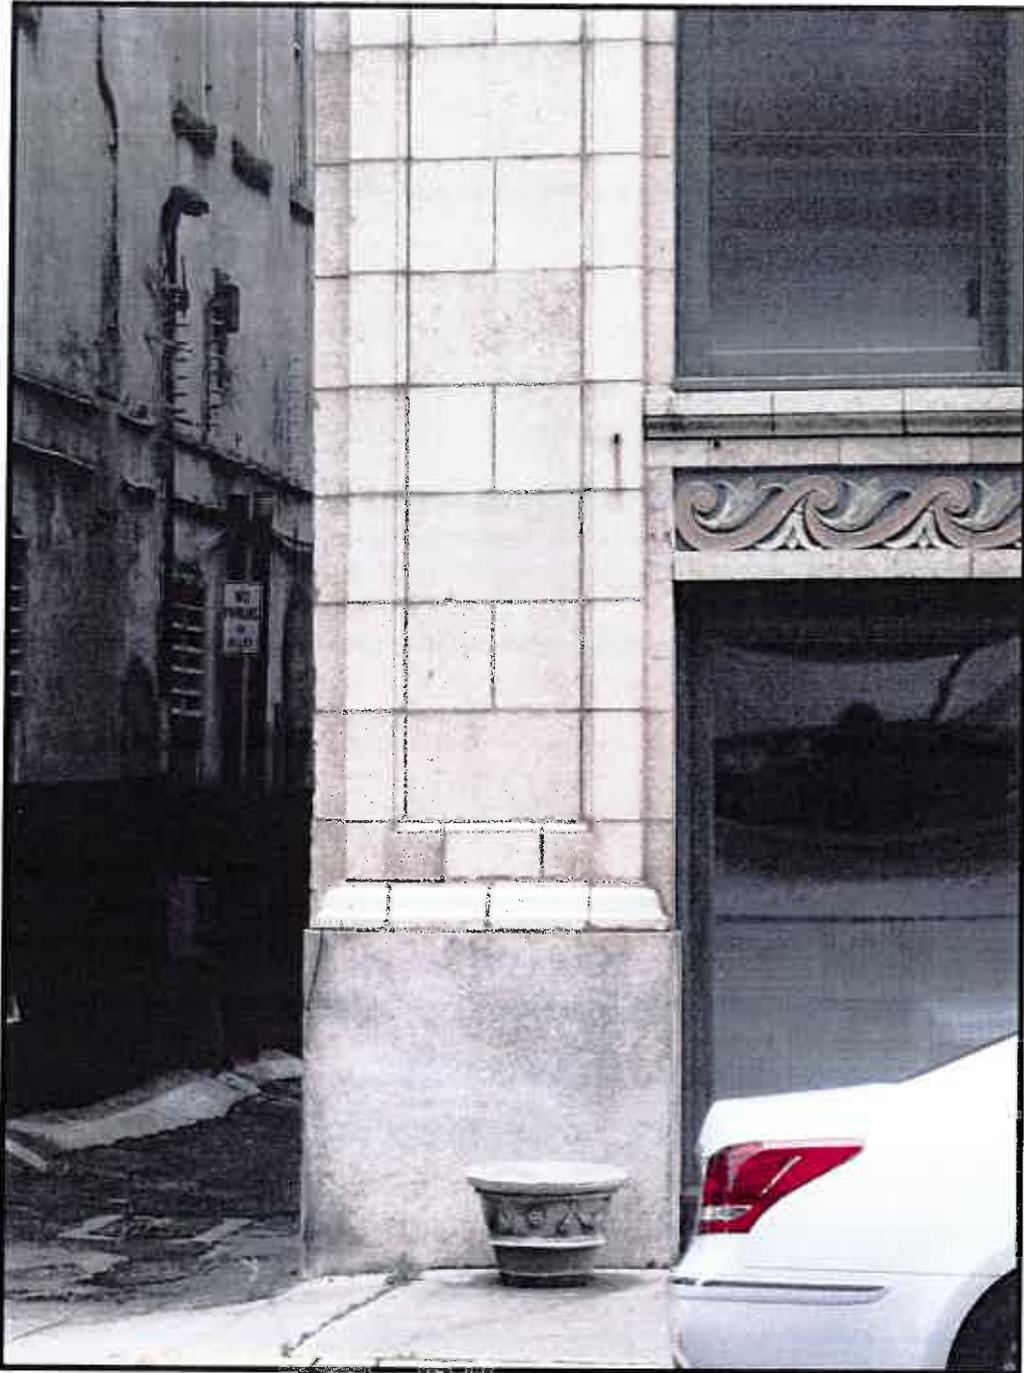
Close-up of second floor left bay of the façade. Note extensive cracking and spalling of terracotta tile.
